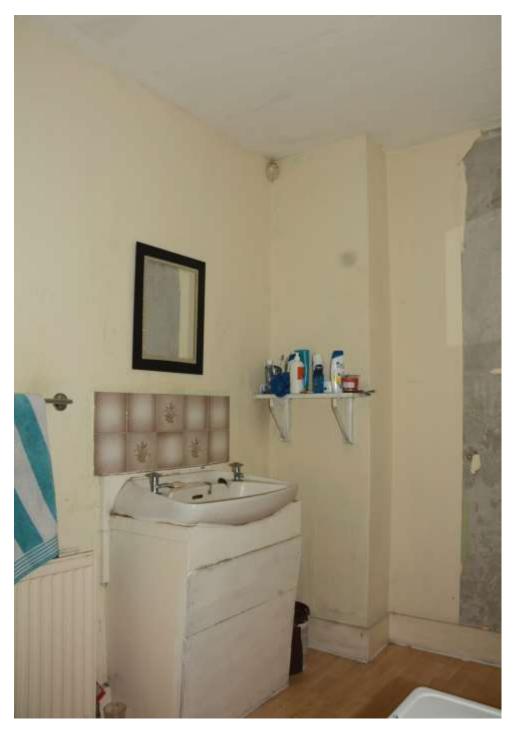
The bathroom, looking toward the NW corner and one side of the chimney breast. It is likely that this room and the part of the adjacent landing and cupboard were formed out of one larger original bedroom, with a fireplace on the northwest wall
